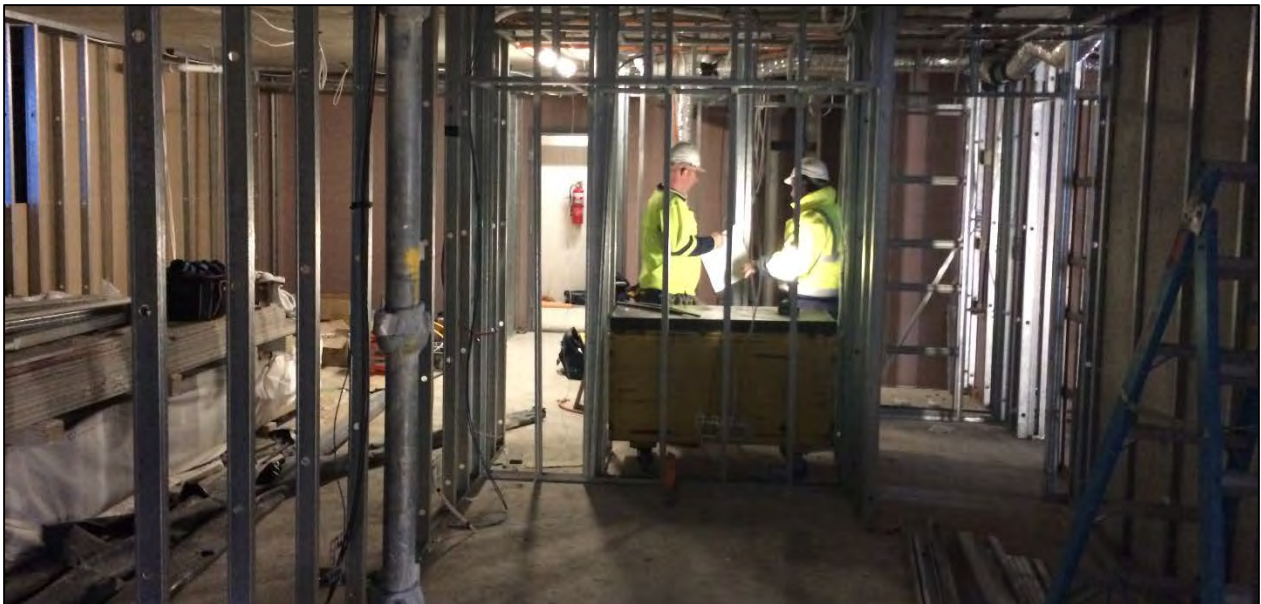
Level 2 – Service conduits are inserted prior to finishing wall partitions.
